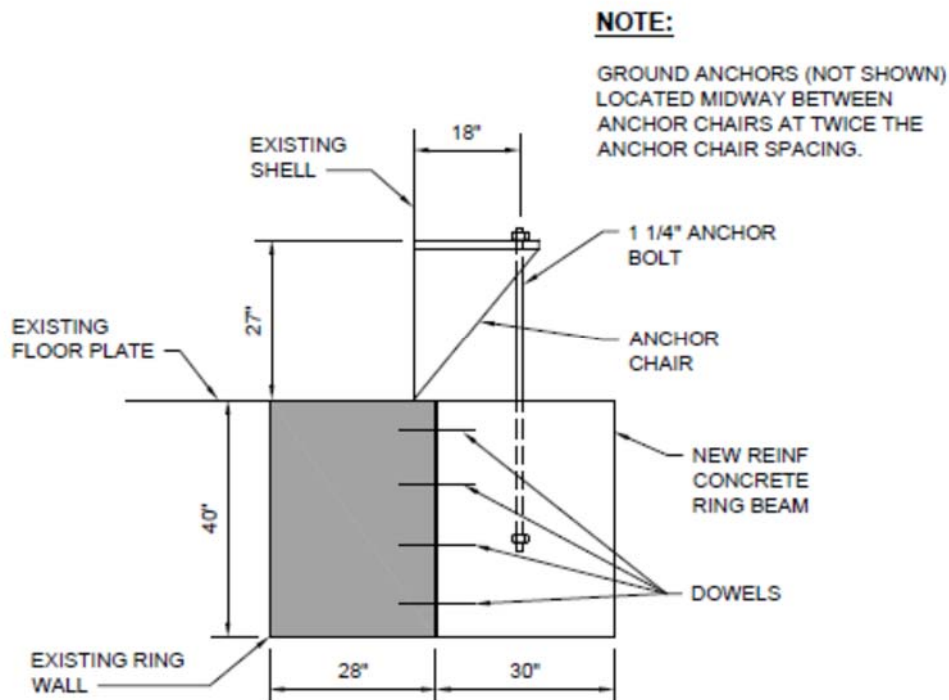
Supplementary External Ringwall with Anchor Bolts and Ground Anchors
